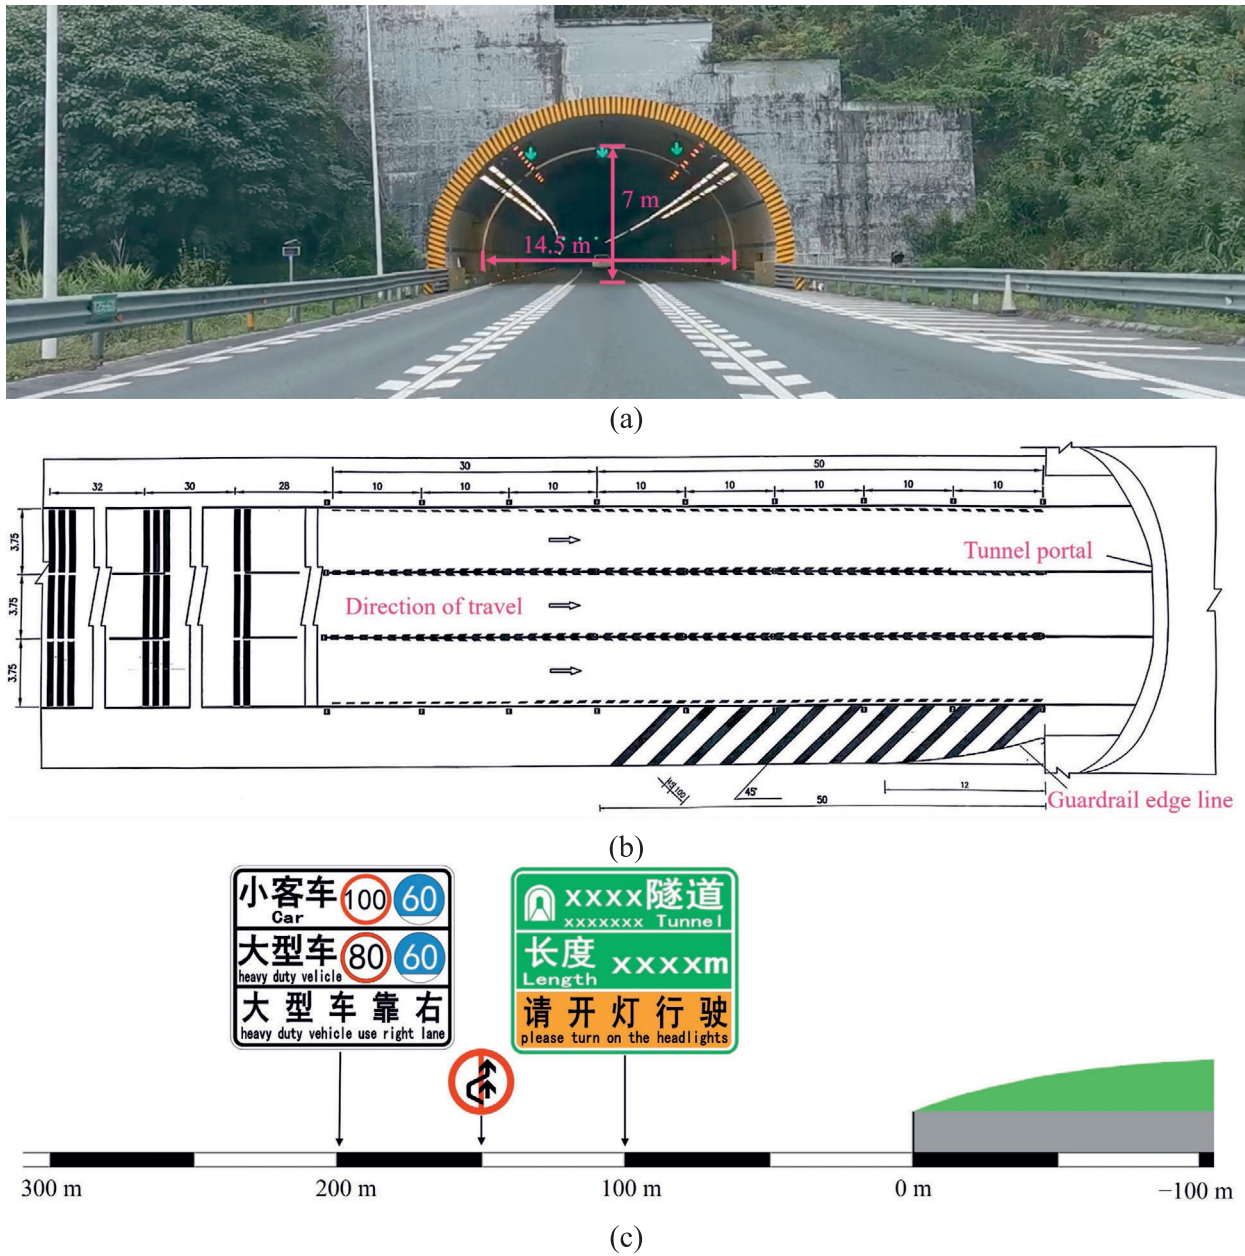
Configuration details of tunnel portals and approach zone traffic control devices. (a) Cross-sectional tunnel dimensions, (b) pavement markings and guardrail transition, and (c) layout of regulatory and informational signs.
